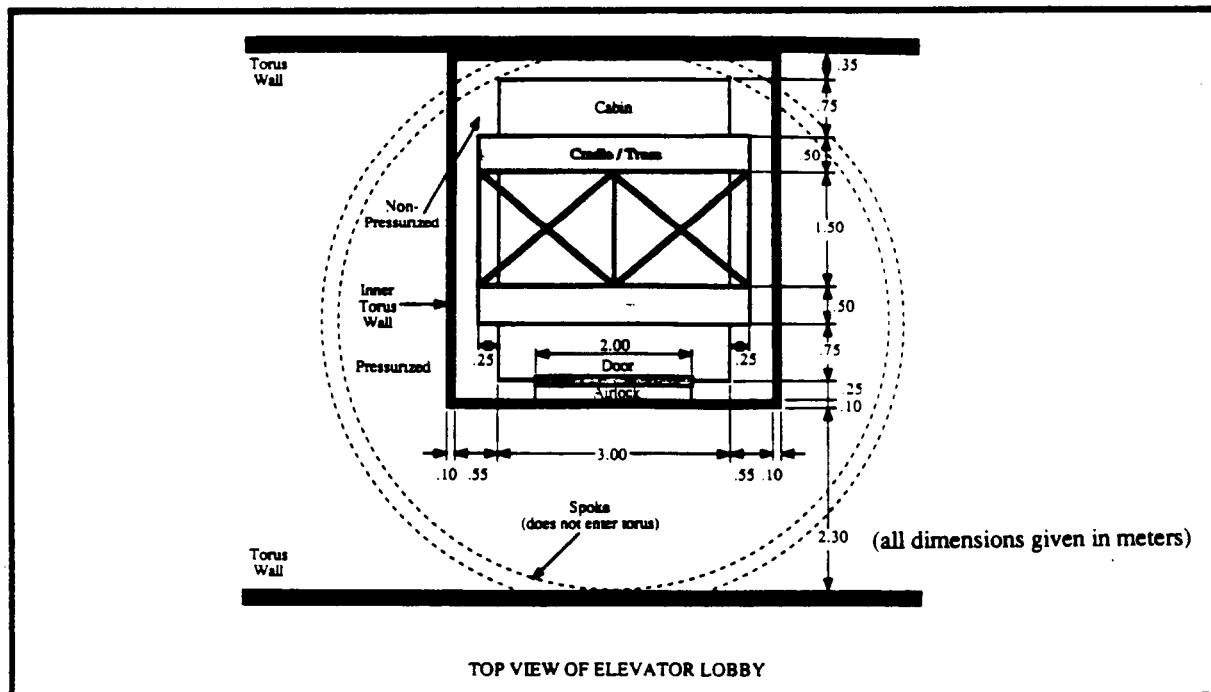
Top View of Elevator Position in Torus/Spoke Cross Section
